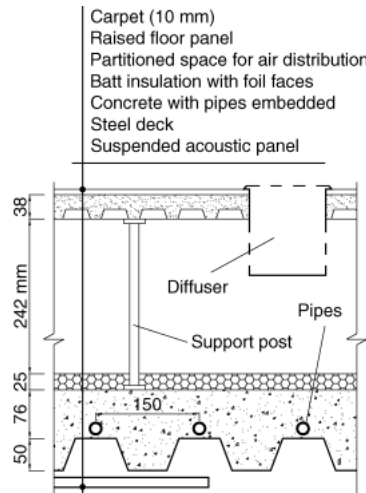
Cross-section of the raised floor and the hydronic radiant slab
